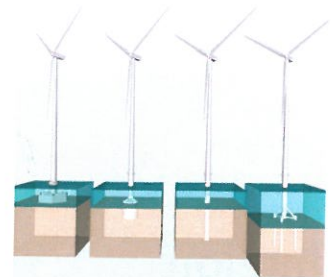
Foundation concepts for offshore wind turbines. From the left: gravitational foundation, bucket foundation, monopile foundation, and tripod foundation.
